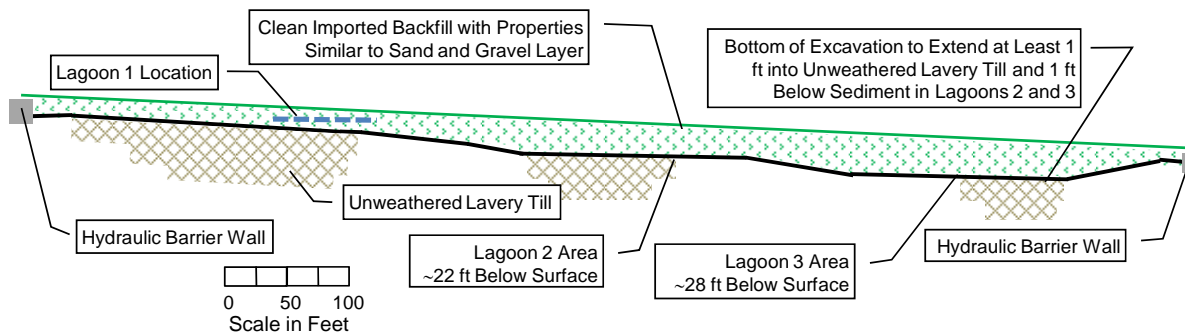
Conceptual Cross-Section View of the Backfilled WMA 2 Excavation
